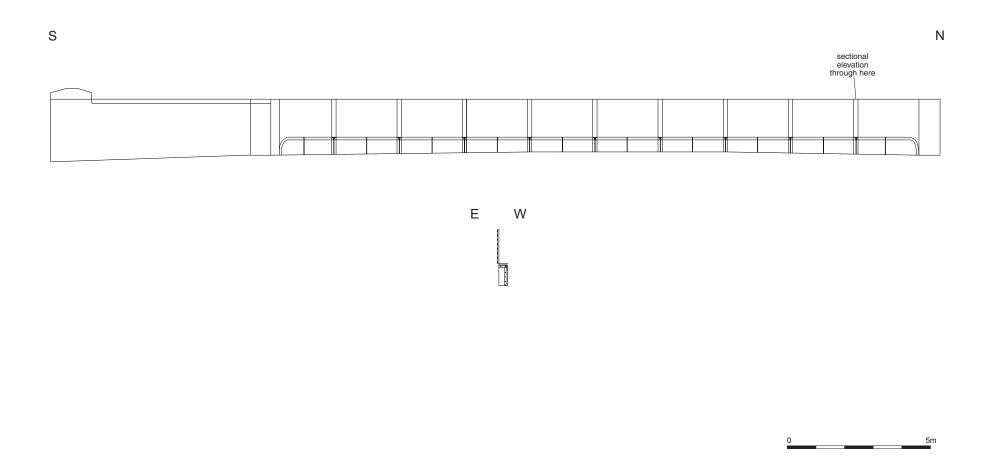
East-facing elevation and north-facing sectional elevation through the western bridge parapet in Angel Lane
